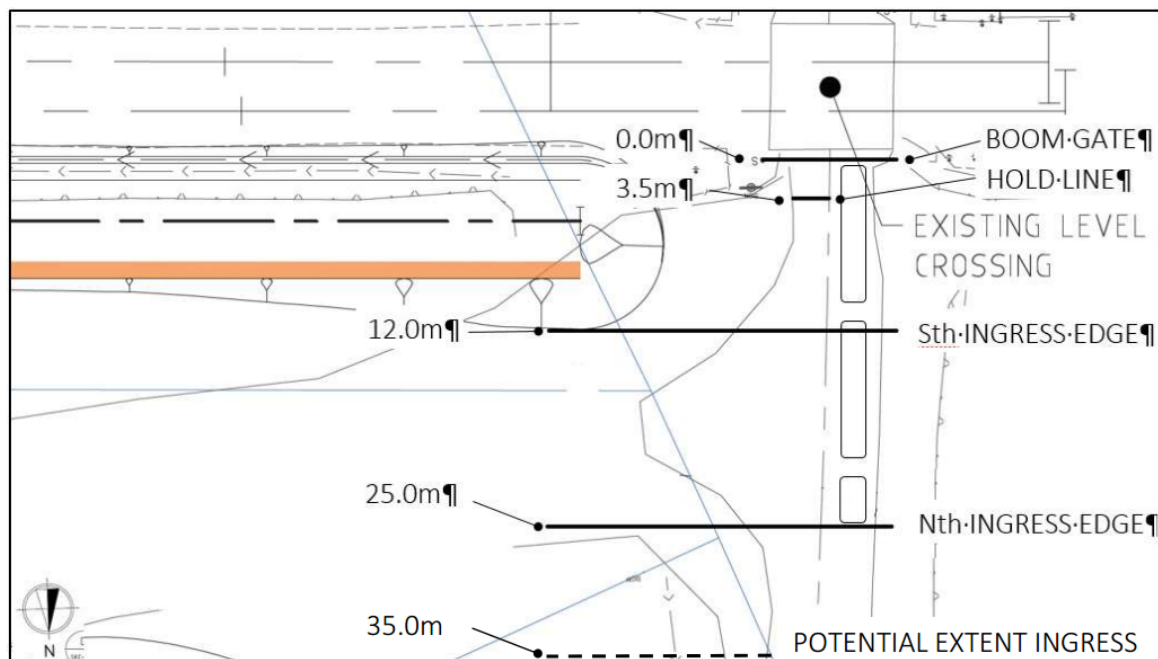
Layout of existing and proposed Cunningar Road ingress.
